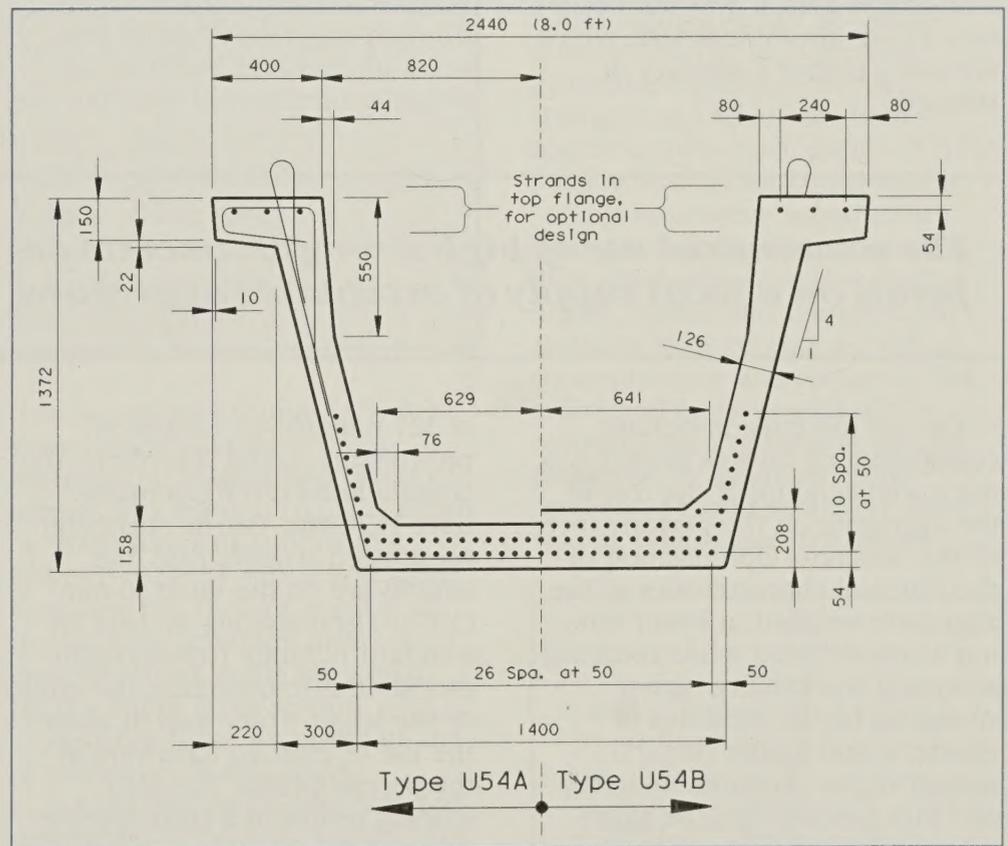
Cross section and prestressed strand patterns of U54 beams. (Note: Dimensions are shown in millimeters; 1 mm = 0.0394 in.)
